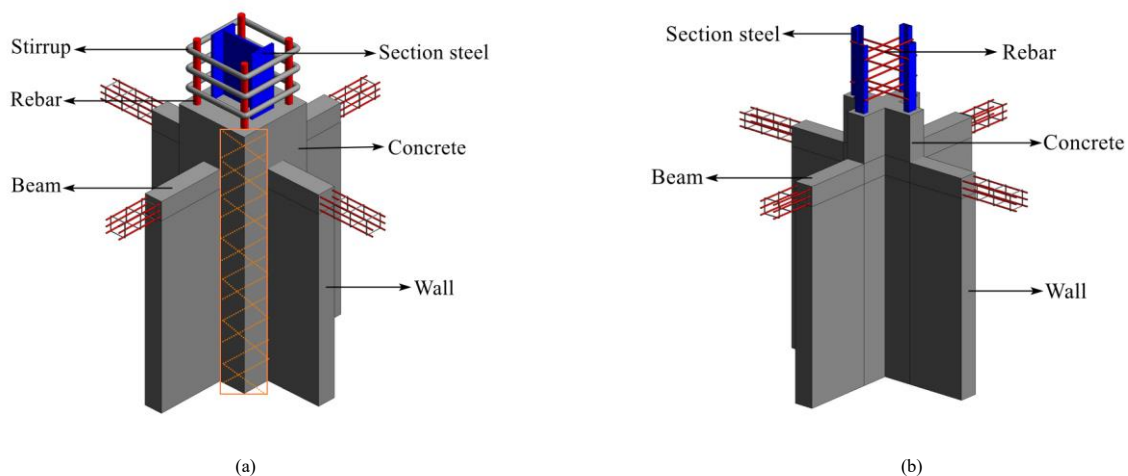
Steel Reinforced Concrete Columns: (a) Ordinary square column; (b) Cross-shaped column
